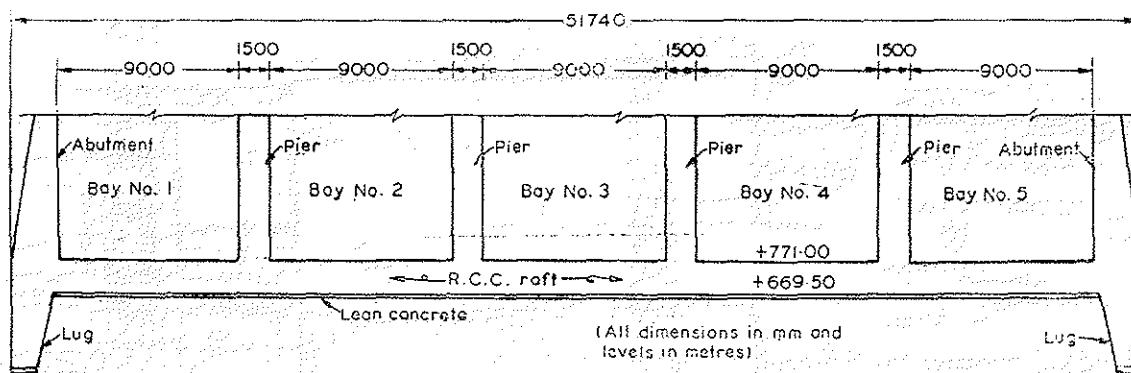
Typical details of Abutment as Trough Section.
